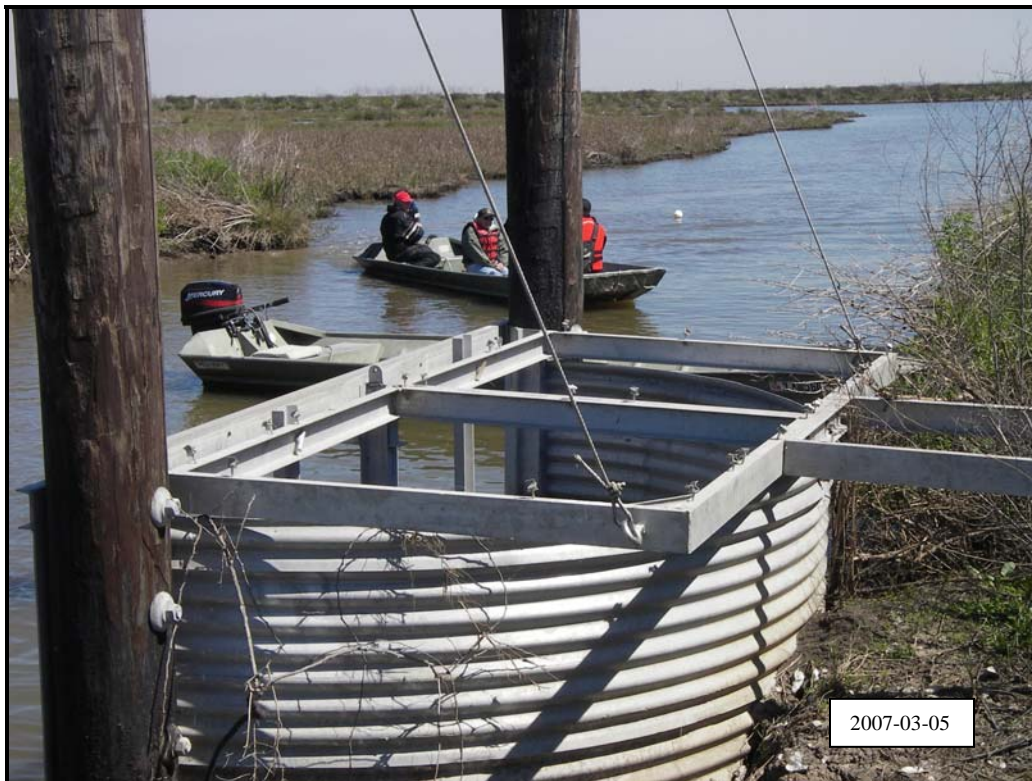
, Structure No. 1, showing missing grating and erosion around structure.
